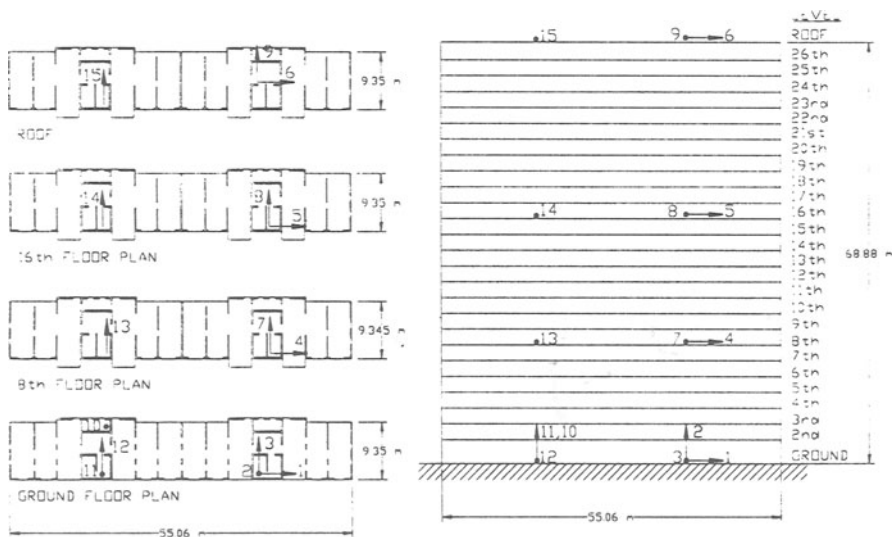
Plan, Elevation and Sensor Location for La Inmaculada Plaza II.
